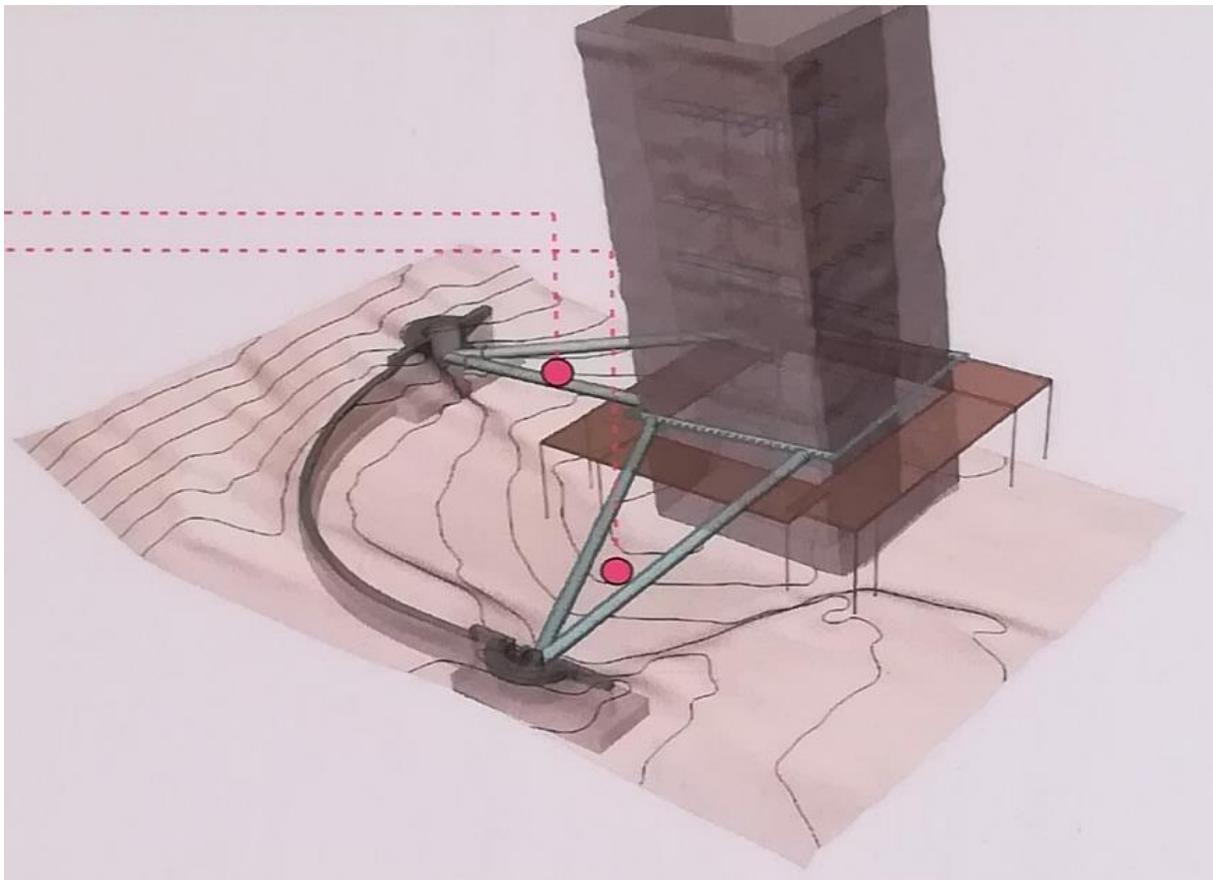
Retaining structure to stabilize the leaning tower of Bad Frankenhausen
